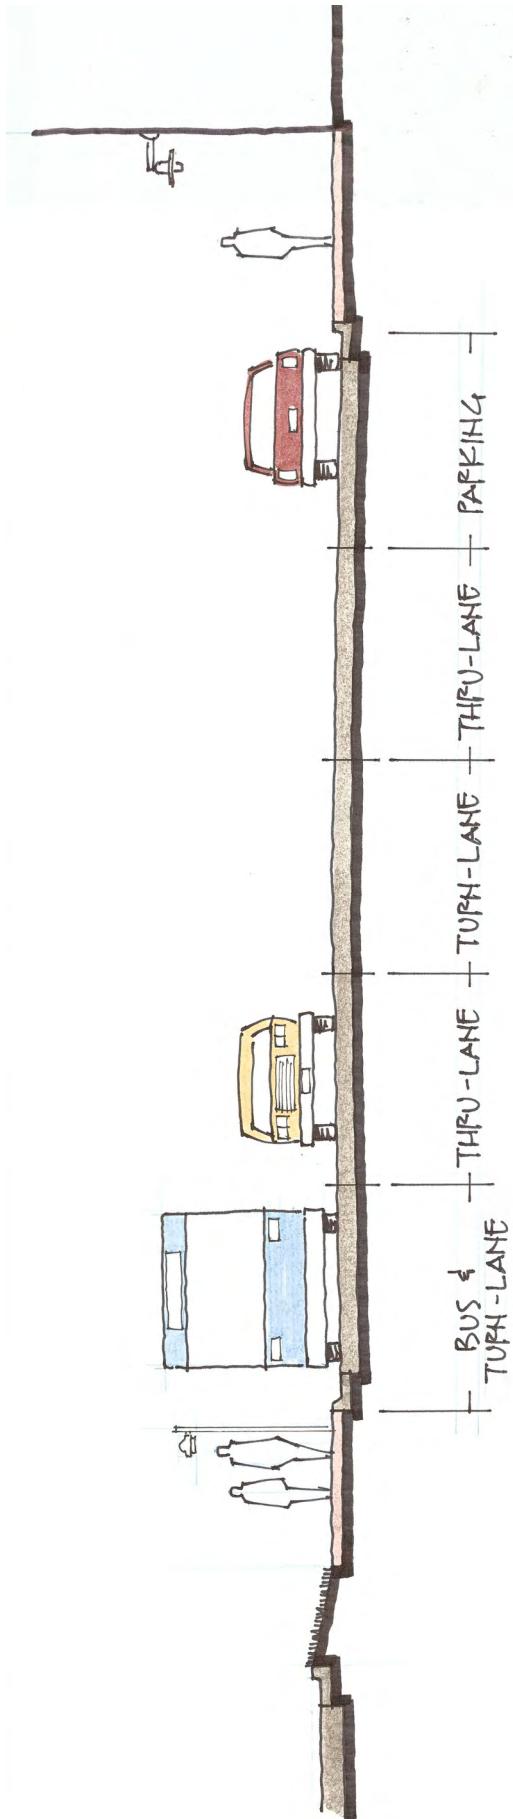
Section C (3-lane section with bus turn-out and parallel parking).
